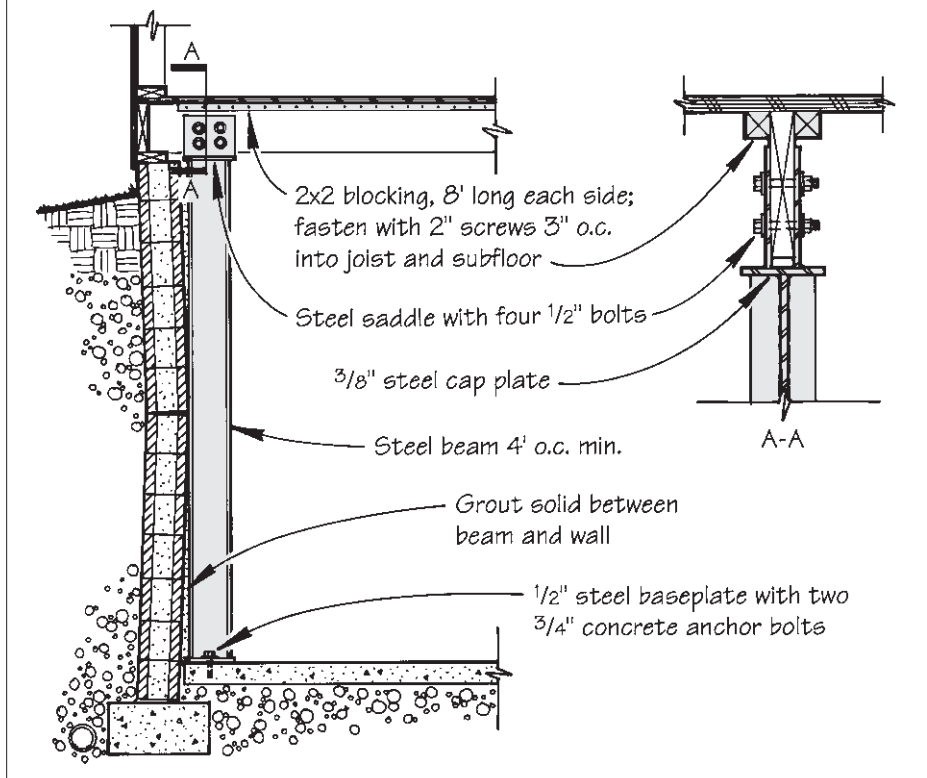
Vertical steel beams 4 feet on-center can strengthen a cracked block wall. The beams must attach securely to the joists and slab. Where there is no slab, footings must be poured.
